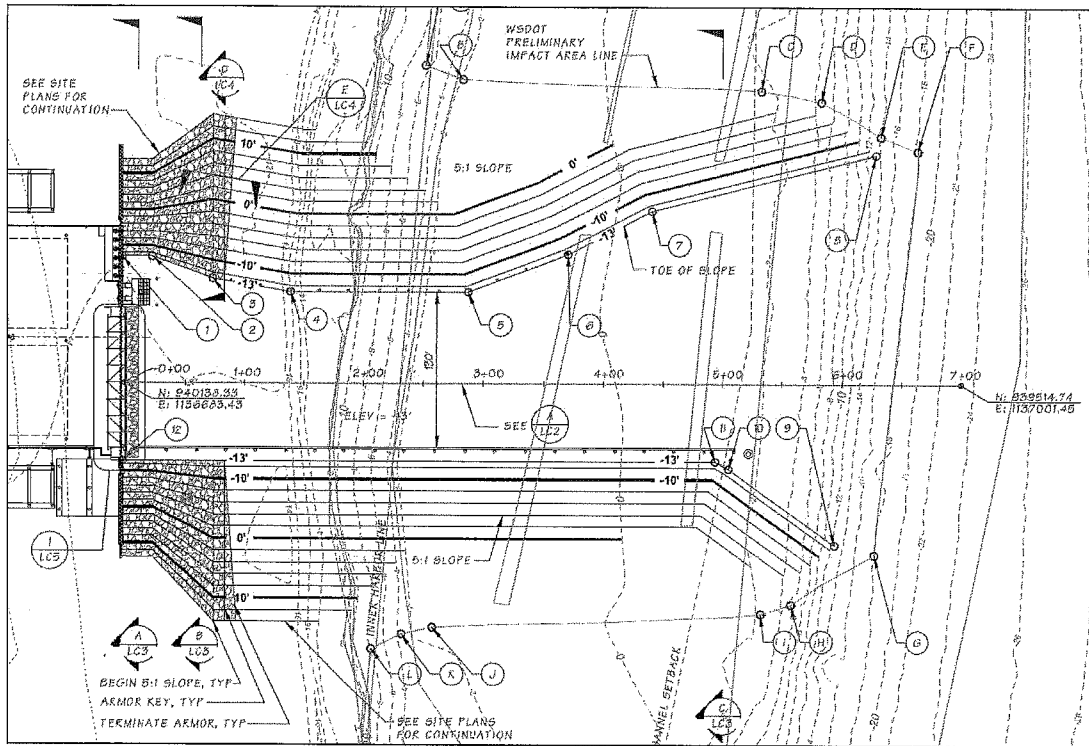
Reconfigured launch channel plan (provided by HNTB 1/20/2011)
